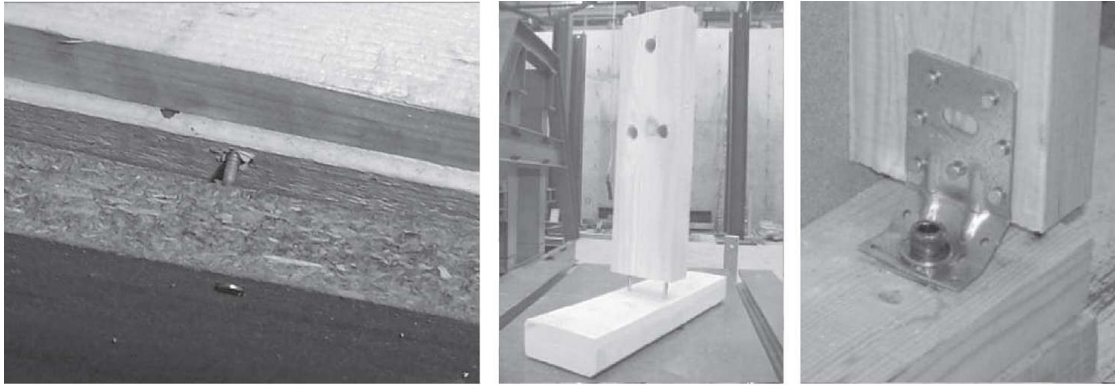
Three joints with metal fasteners used in a shear wall, Humbert et al. [83]
